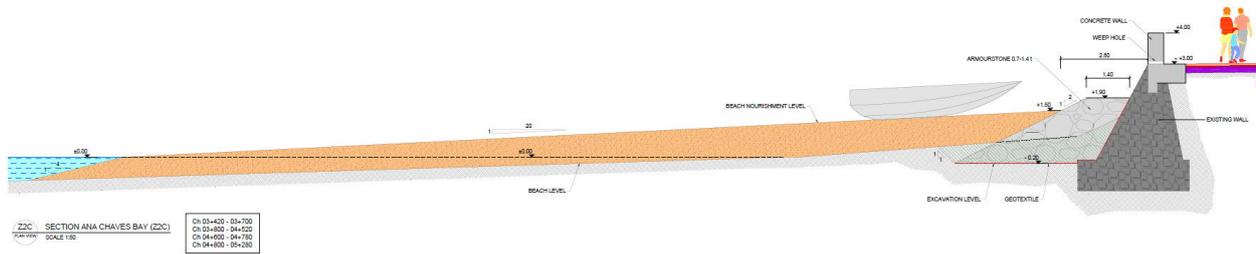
Typical cross section Z2C. Ana Chaves Bay
